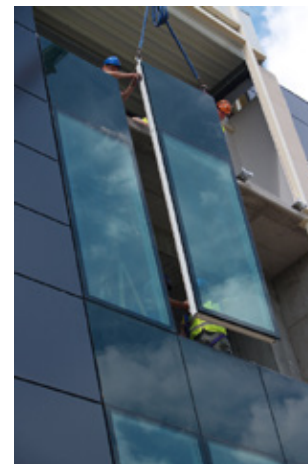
QbissAir modular façade system is fixed from inside the building
